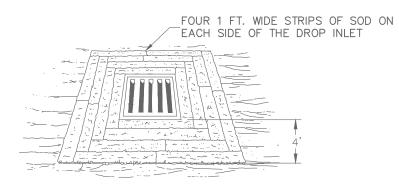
SOD STRIPS PROTECT INLET AREA FROM EROSION (SOURCE VA SWCC) SOD INLET PROTECTION
